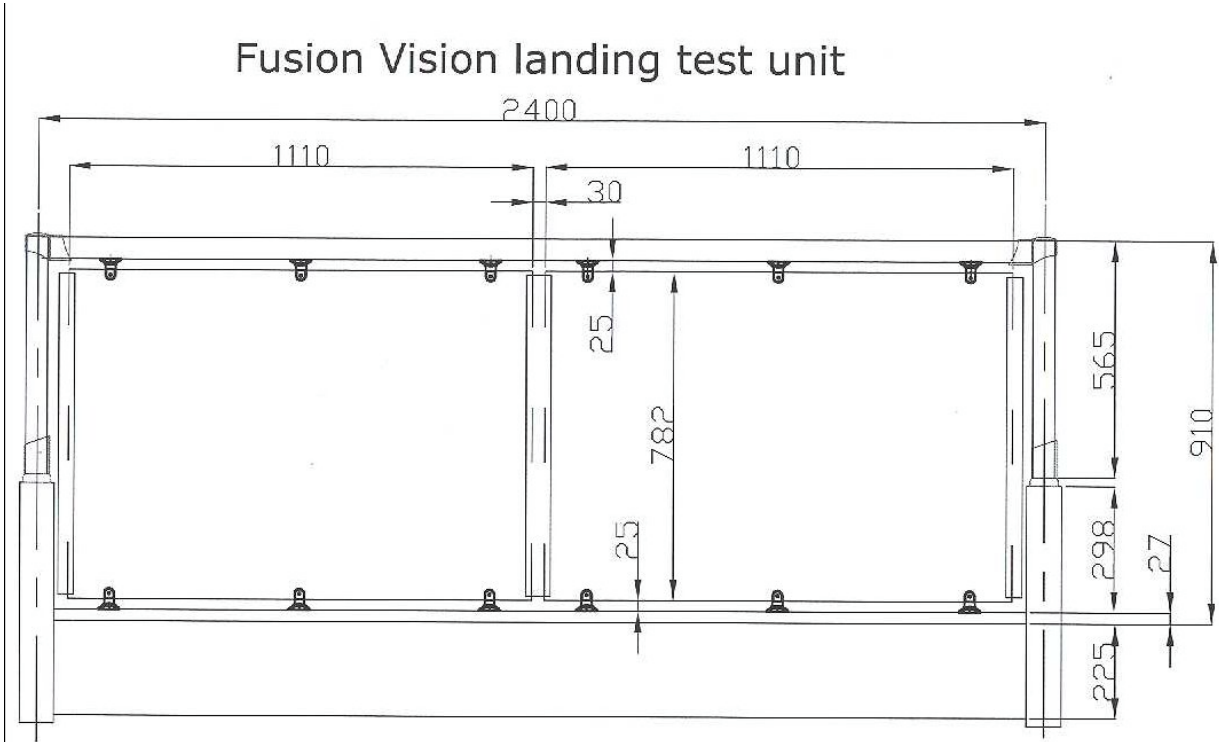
Drawing of Balustrade Handrail Ref: FUSION DOMESTIC INTERIOR BALUSTRADE WITH ACRYLIC IN-FILL PANELS
